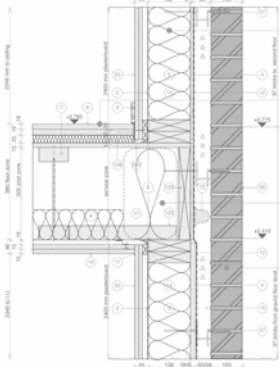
Section through the external wall and floor junction (UPP, 2013).
